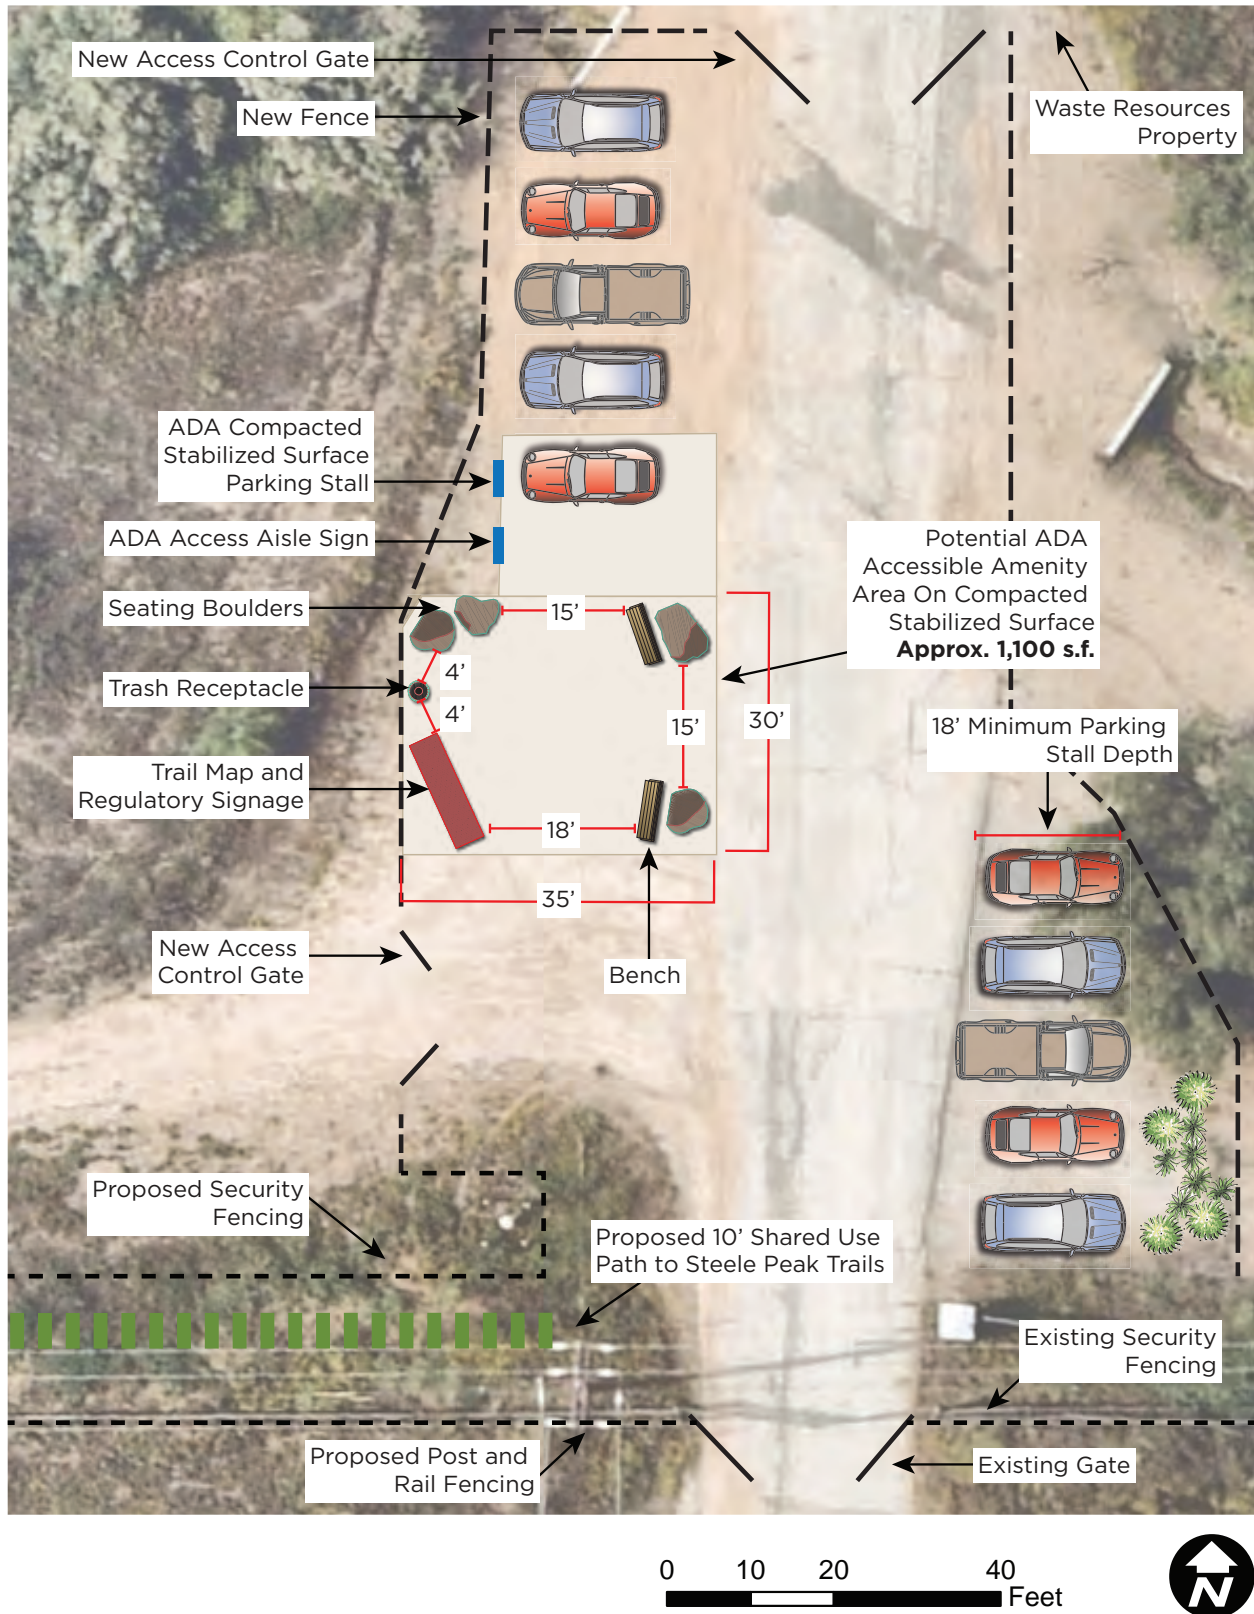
Conceptual layout of proposed trailside seating area near junction of primary trail alignment and parking area trail spur
